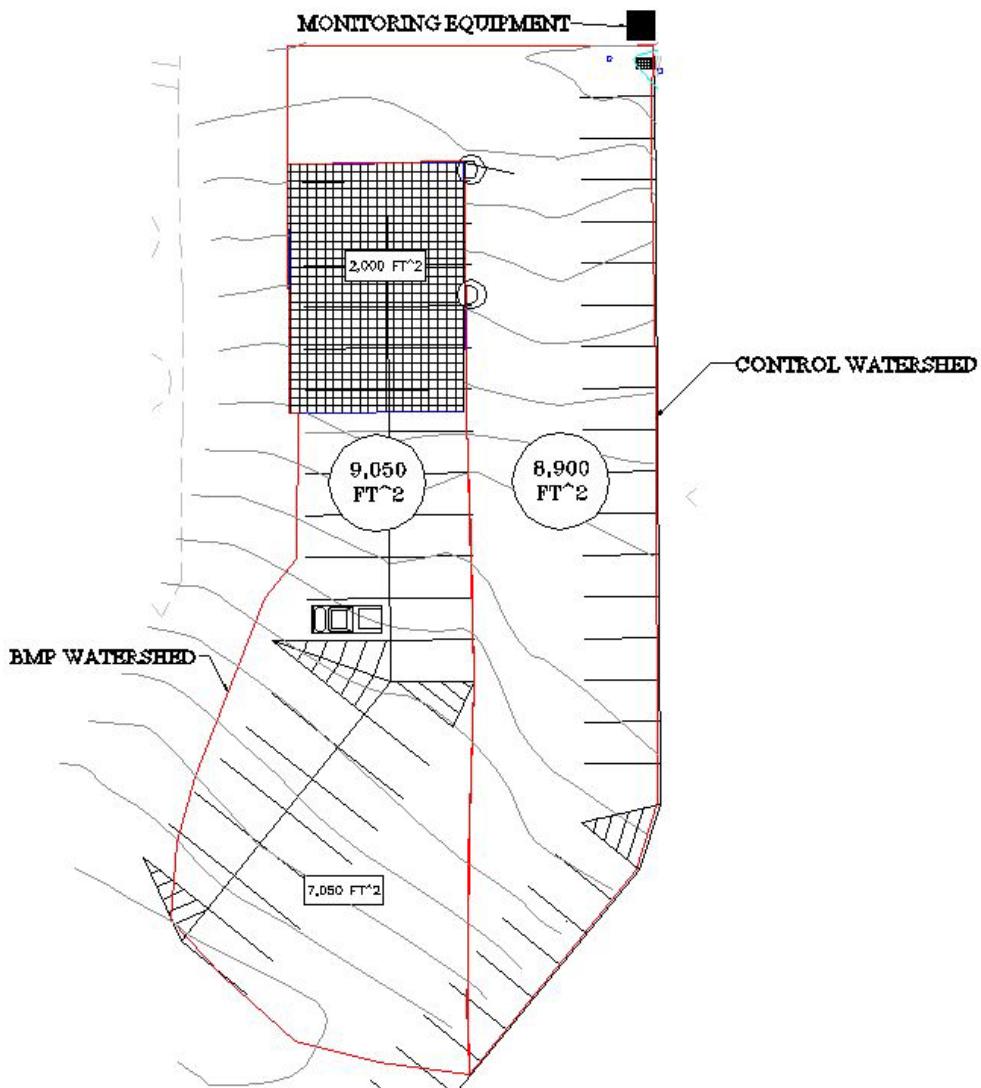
Plan of the Watersheds for the Pervious Concrete and Reference Site
